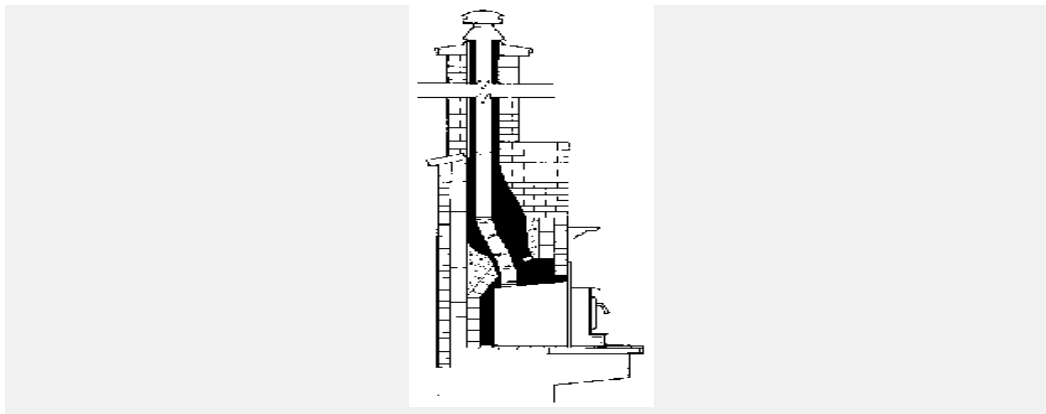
Cross section of a fireplace showing a properly installed fireplace insert with venting.
